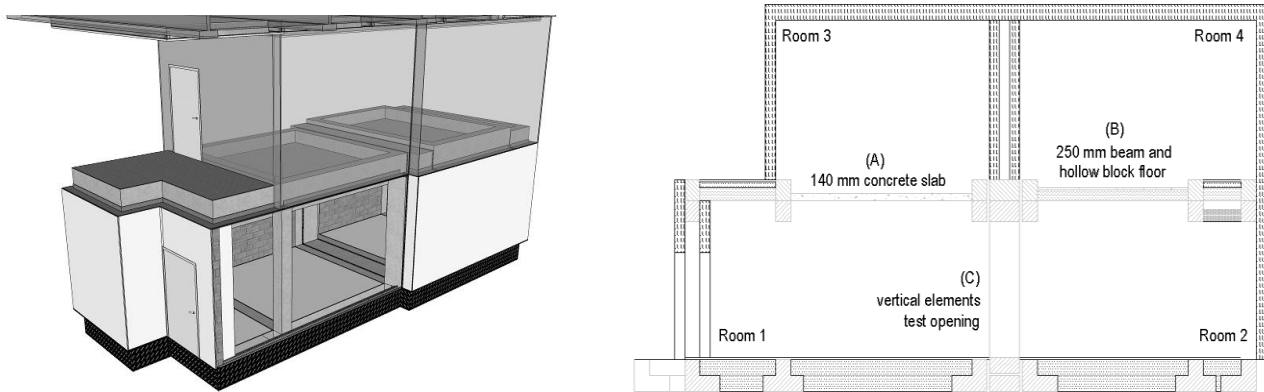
Isolgamma Building Acoustic Laboratory: (A) concrete slab, surface 12,96 m²; (B) beam and hollow block floor, surface 12,60 m²; (C) opening for the mounting of vertical elements, 10 m².
